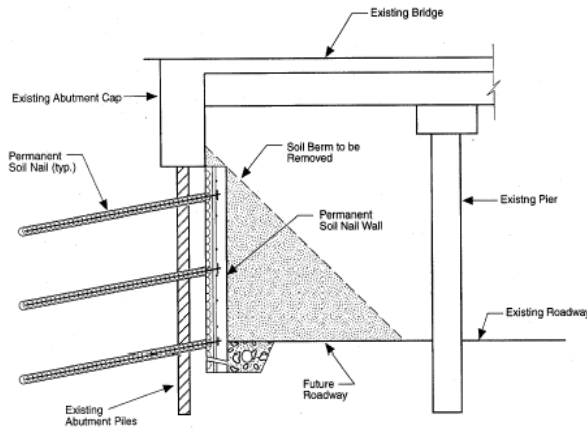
Typical Soil Nail Wall Cross Section for Existing Bridge (after Galvan, 2012).
